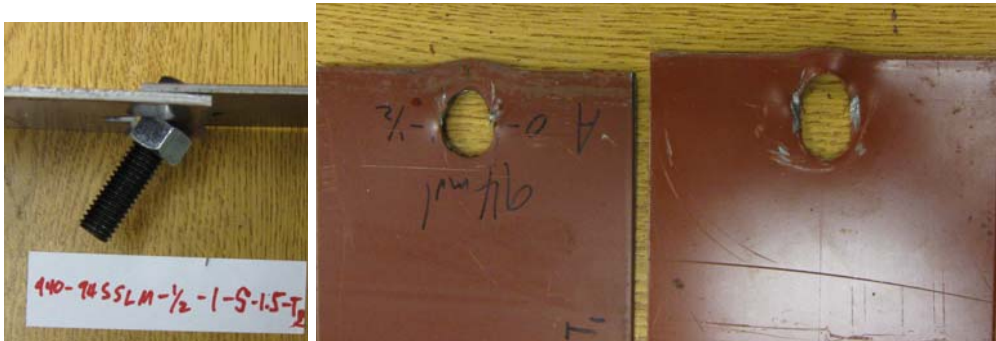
Shear Failure of Test Specimen 94O-94SSLM-1/2-1-S-1.5-T2
